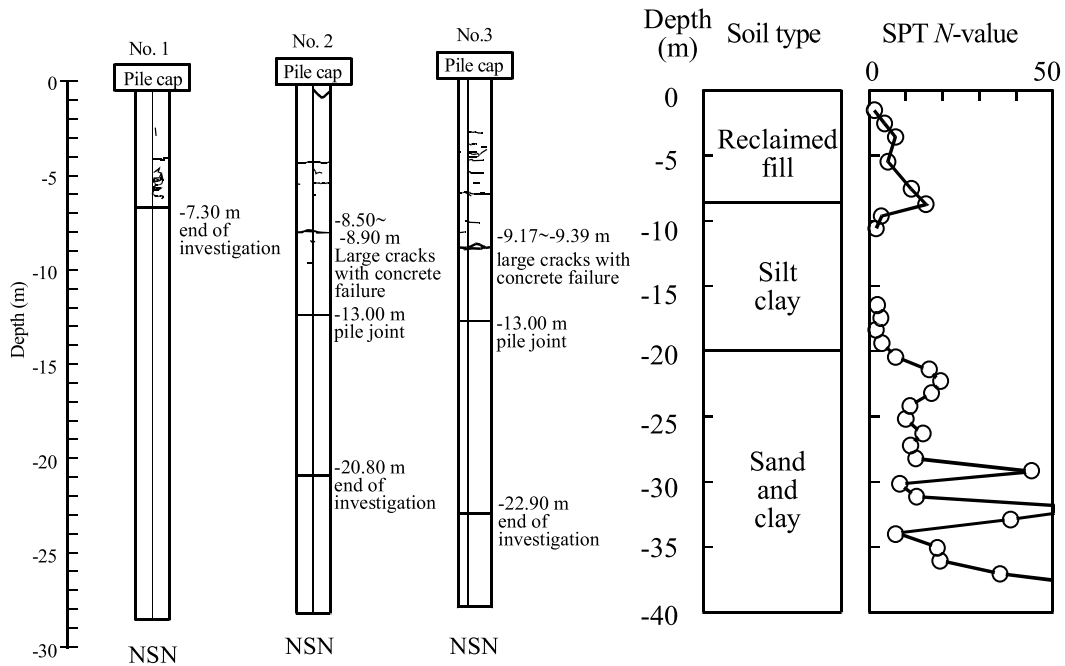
Failure pattern of a pile foundation under a building in Kobe city after 1995 Kobe earthquake (Tazoh, 2007).
